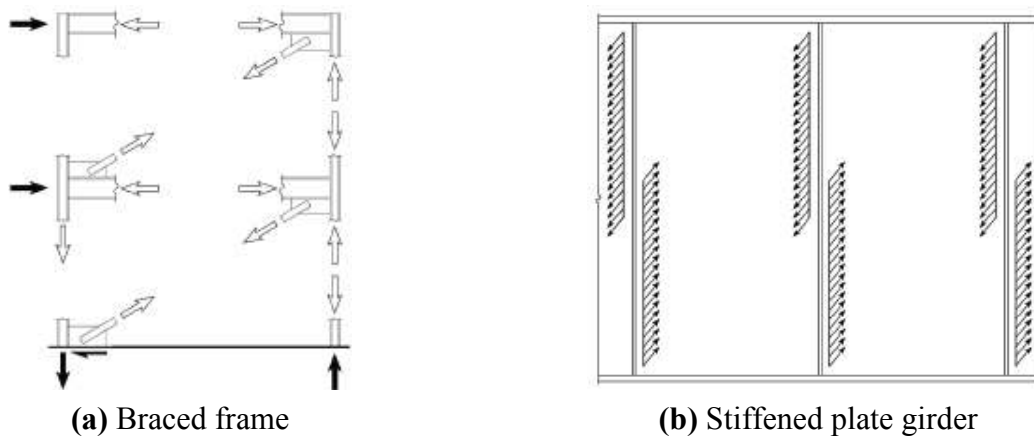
Braced frame and stiffened plate girder analogies (Sabelli and Bruneau, 2006)
